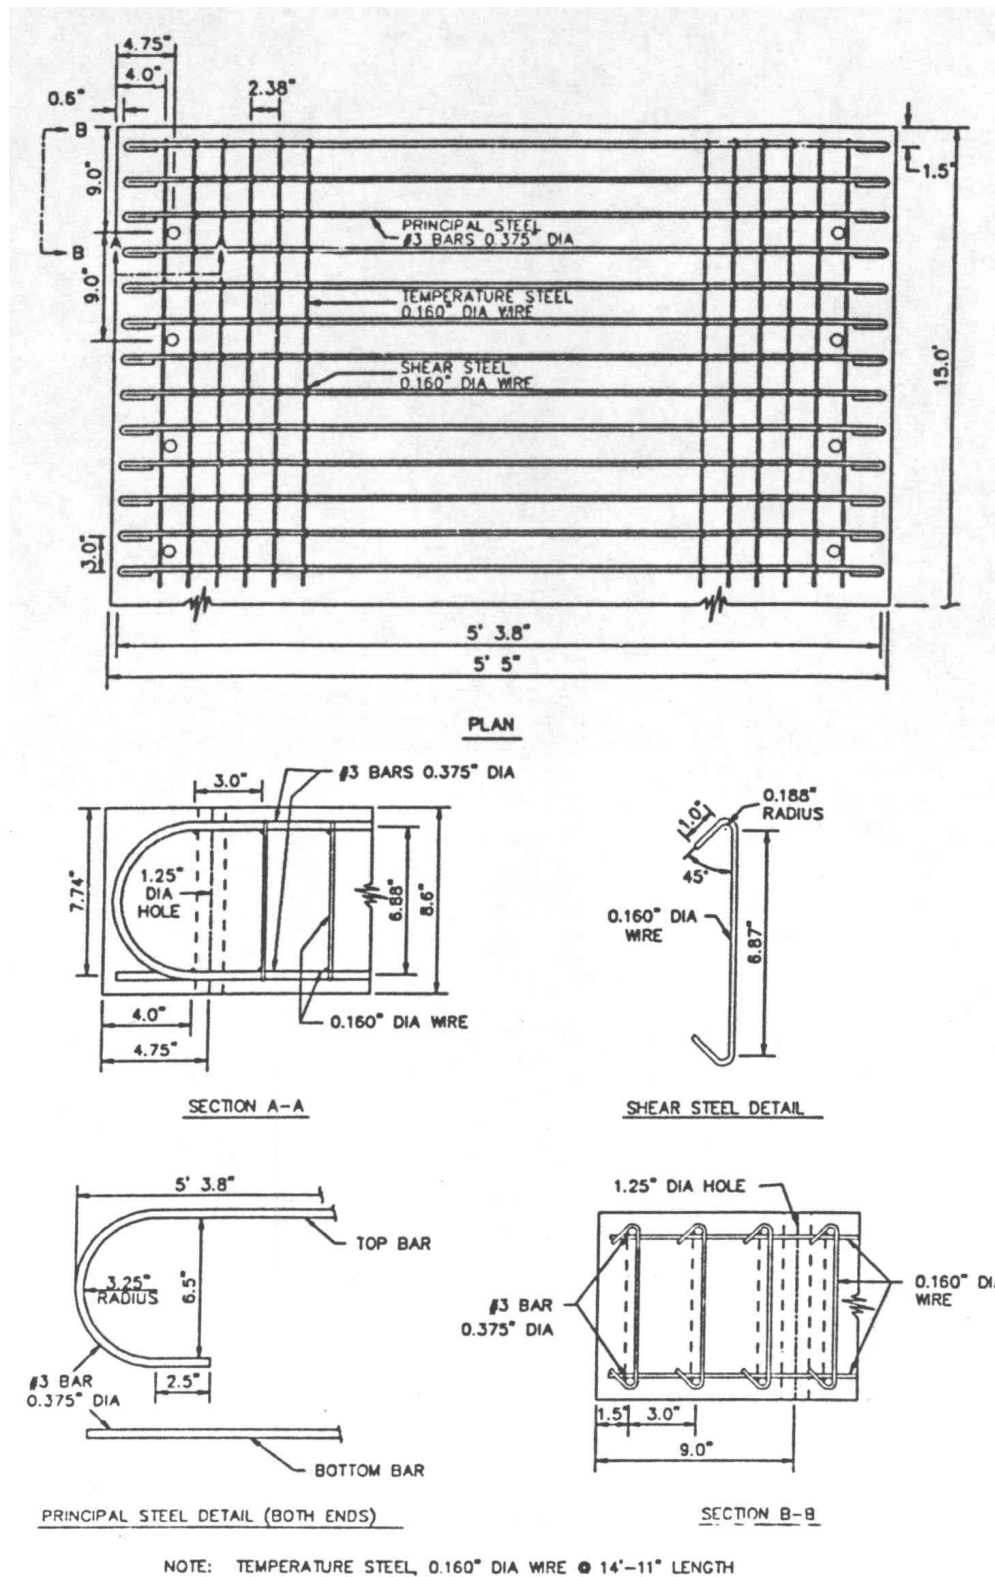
Reinforced Concrete Slab Construction, Test 2 (Courtesy of Baylot (1993))
